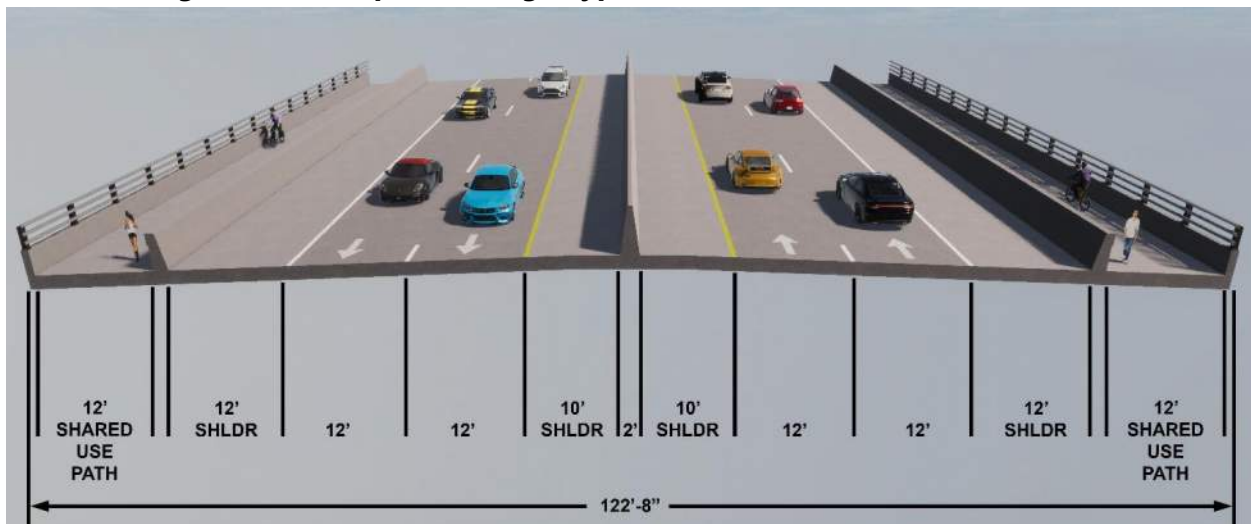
Proposed Bridge Typical Section Over the Manatee River
